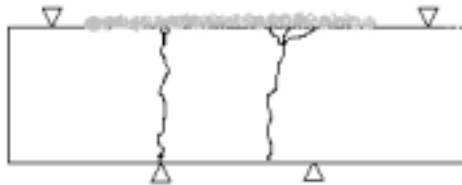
Typical failure mode of beams strengthened with the Tyfo® glass system for shear at 45°.
